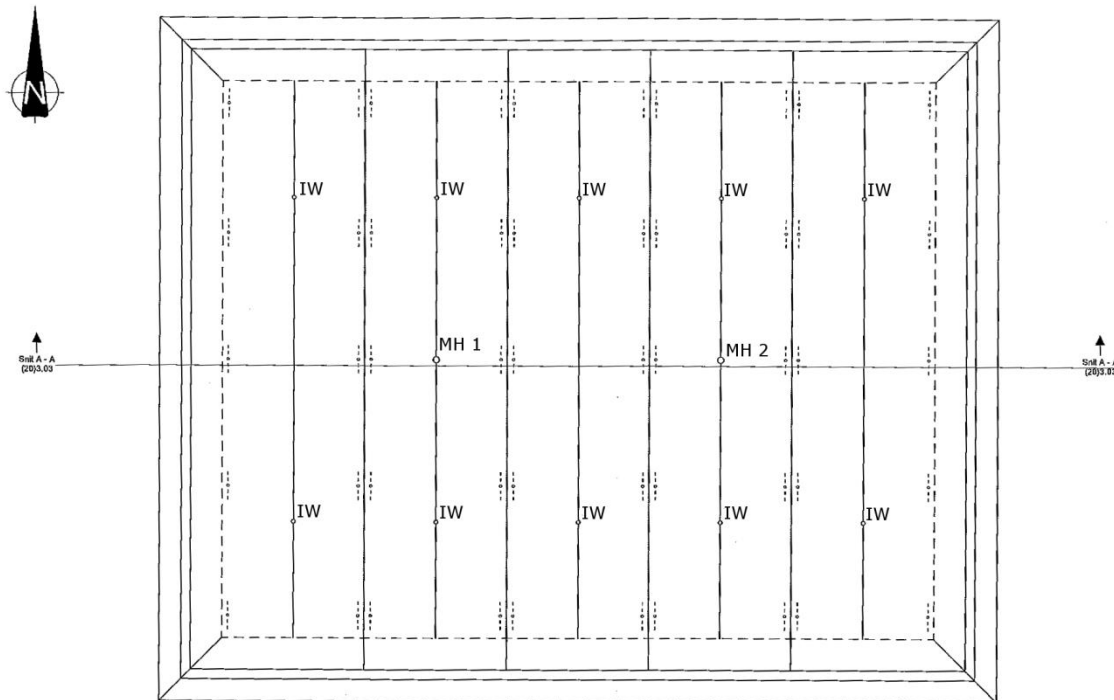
Top view, MH=Manhole, IW=inspection well, --o-- = vacuum valve w. perforated tubes into the Leca layer (PlanEnergi)
